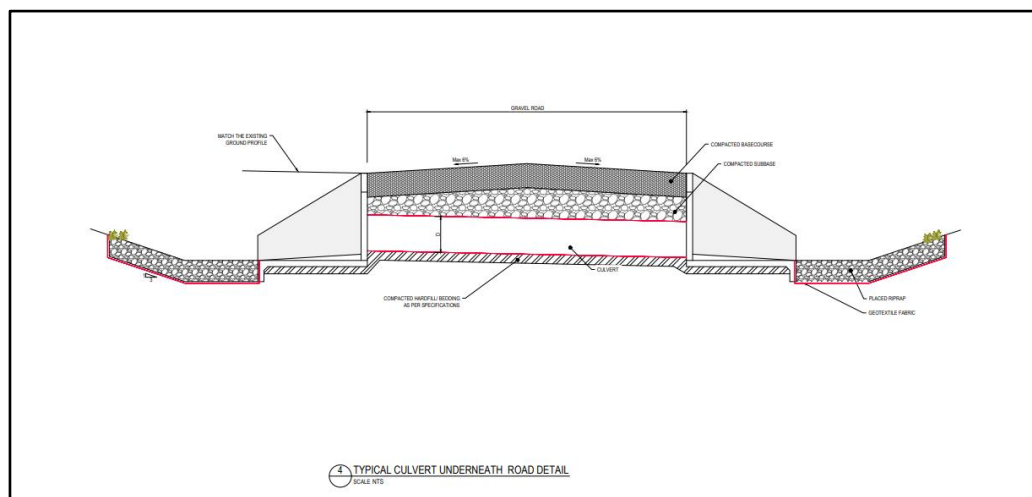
Access road cross section with culvert (Source: Beca Civil Design Report).
